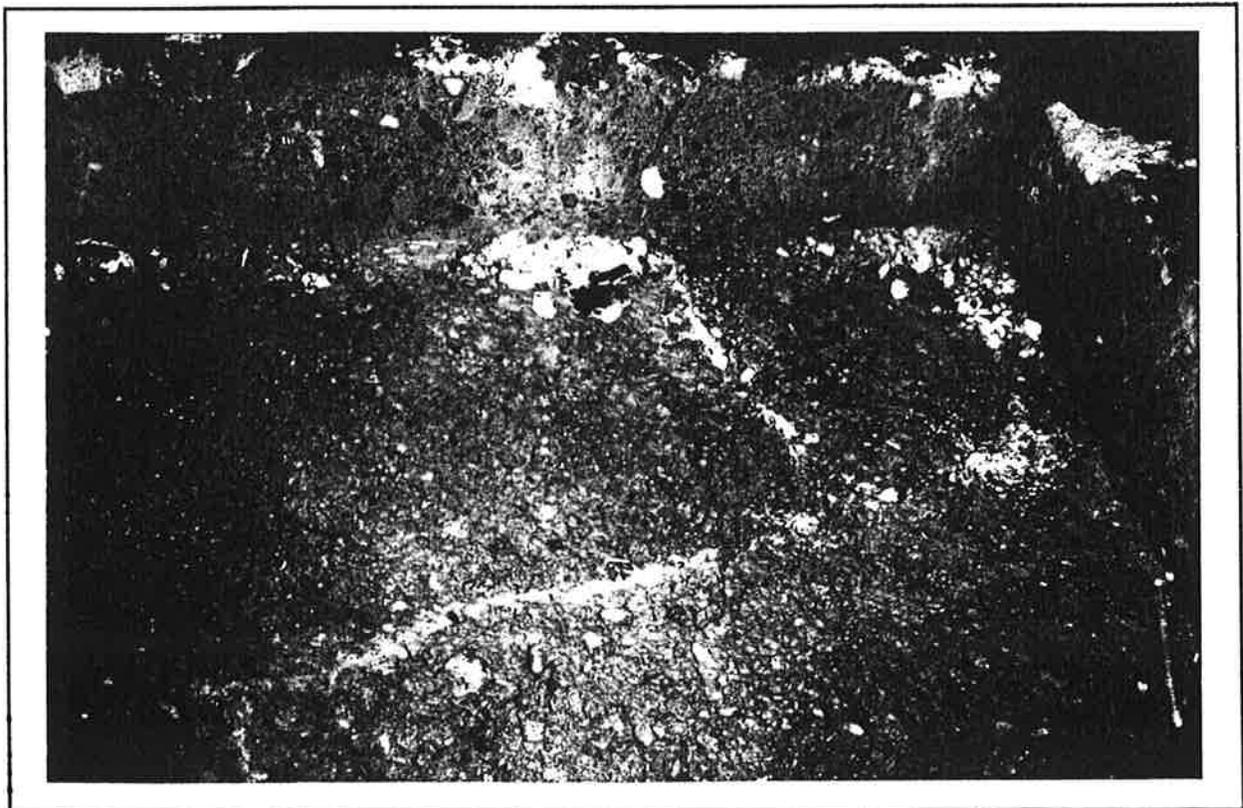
SECTION OF CONCRETE PRIOR TO REMOVAL FROM DRIP PAD
